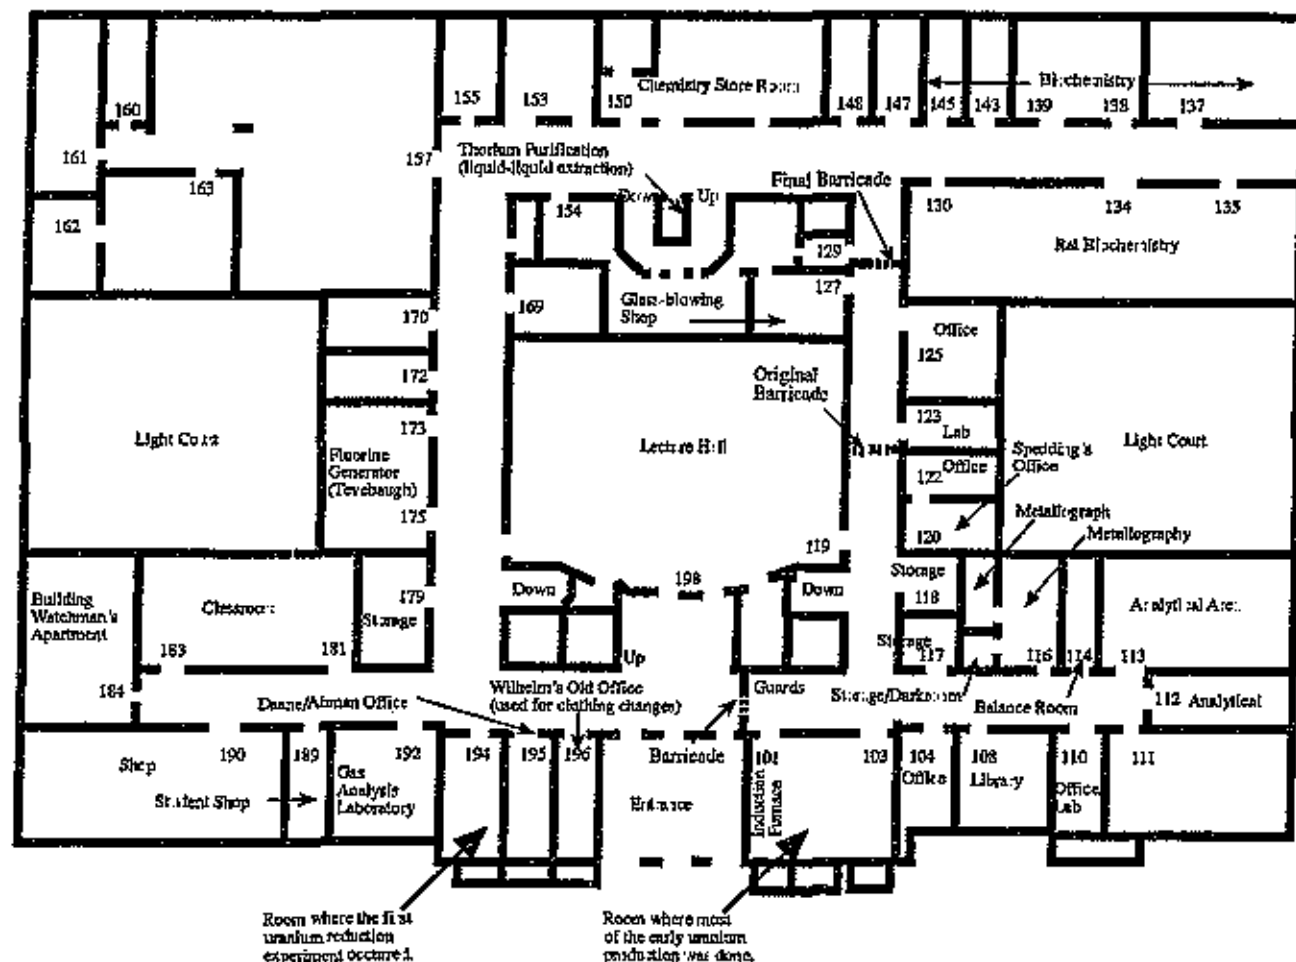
First floor plan of the Chemistry Building where the research and development work were carried out. Included are: the barricade on the east hallway and Room 101/103 where the early reduction experiments for the University of Chicago were completed. (The labeling for these rooms was provided by Norman Carlson, David Peterson, and Harry Svec, former participants on the project.)
